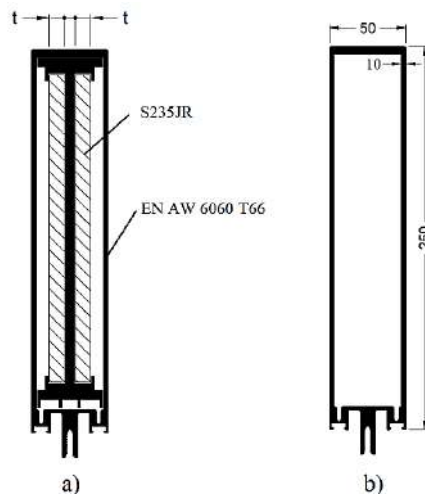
Aluminium profile cross section by manufacturer Schüco [6]
